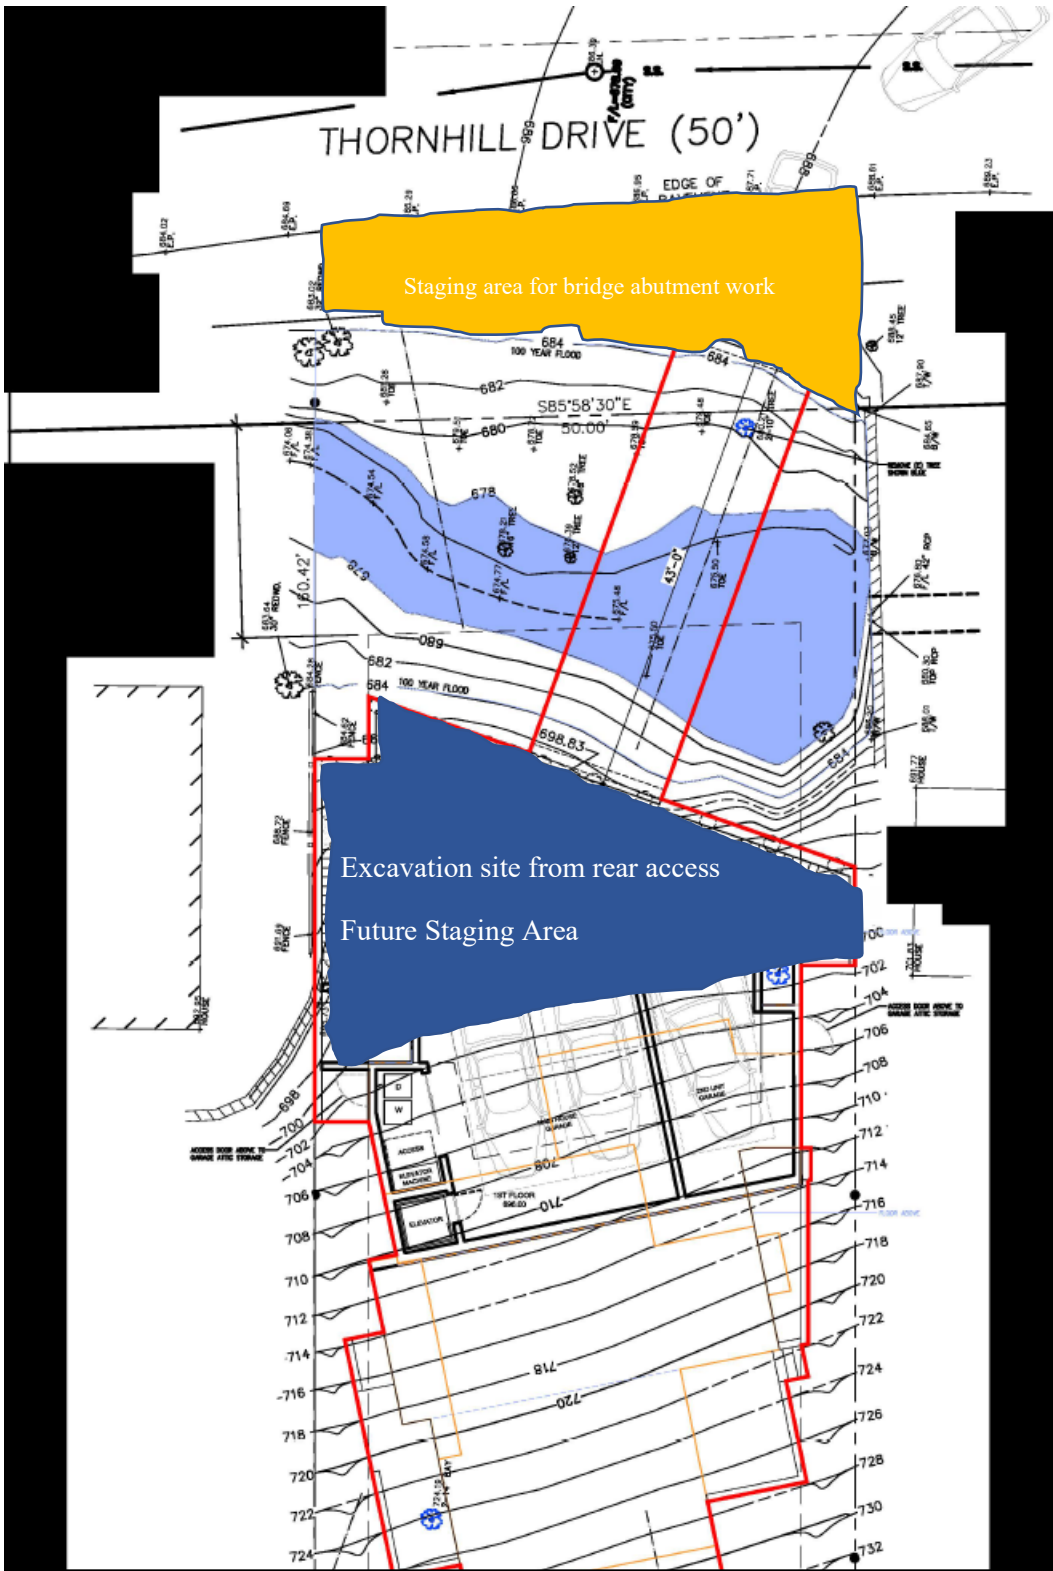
Preparing access to the project site and Thornhill Rd staging site in yellow for bridge abutment. Excavation area in blue from rear path access to build bridge abutment which later becomes the 2nd staging area for house construction after bridge is built.
